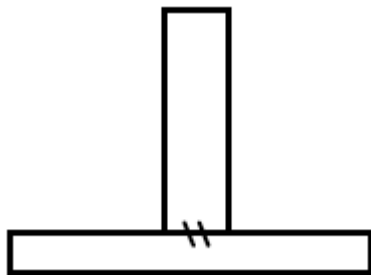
Concrete wall cast against a concrete foundation slab.
